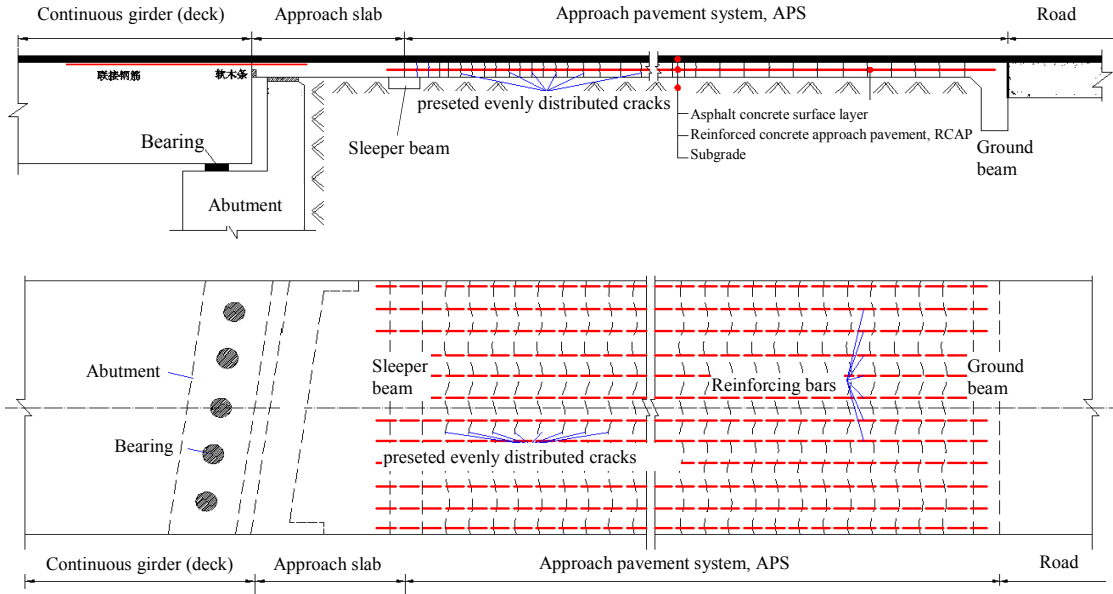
Fully jointless semi-integral bridge system: (a) elevation, (b) plan
